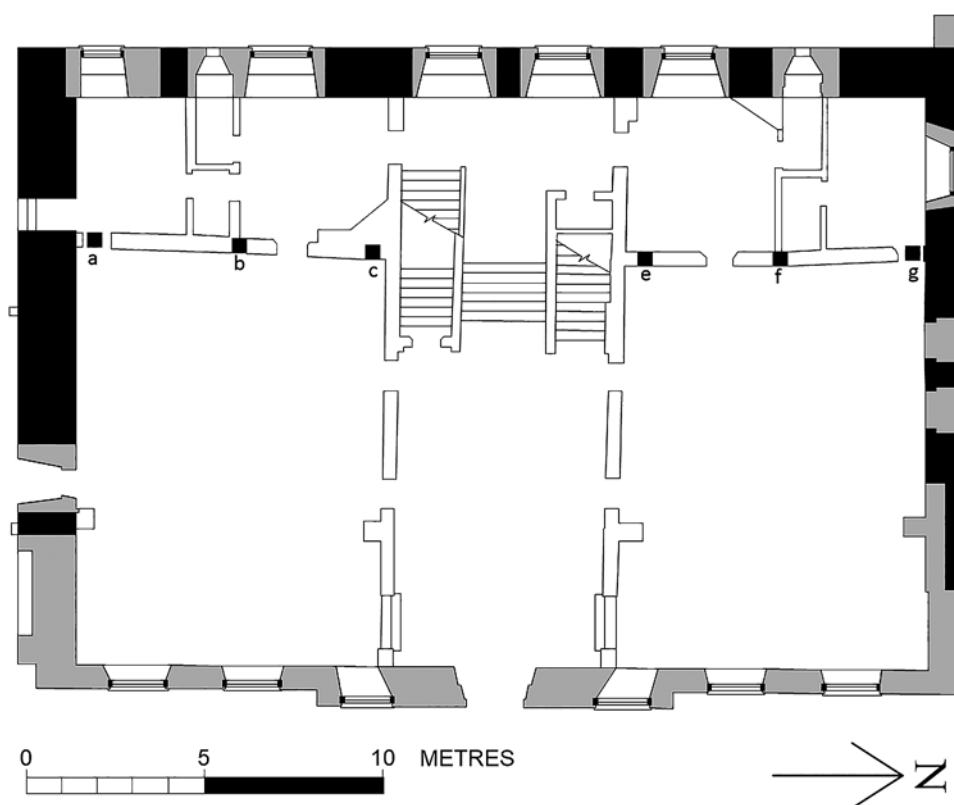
Leicester Castle Hall: Ground-floor plan, with early walls shaded black.
